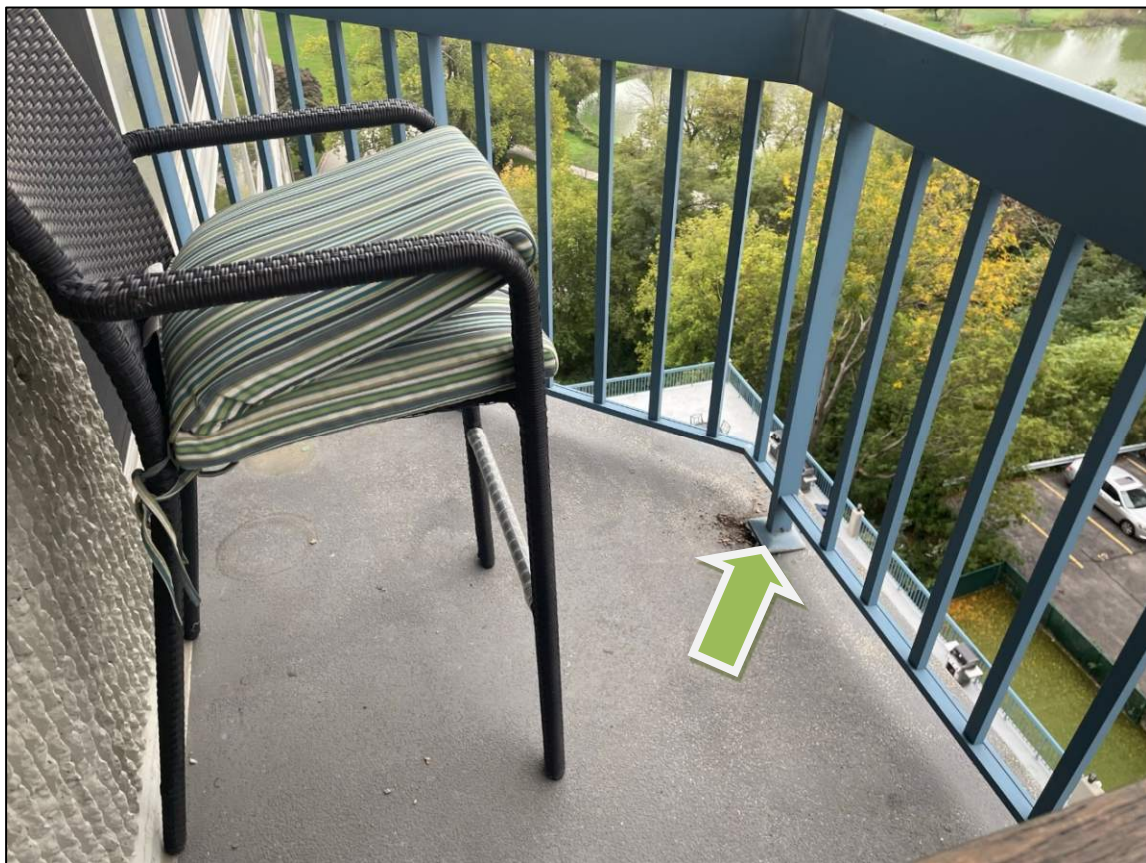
There are railing posts that are framing into the balcony slab that have failed as seen above.
